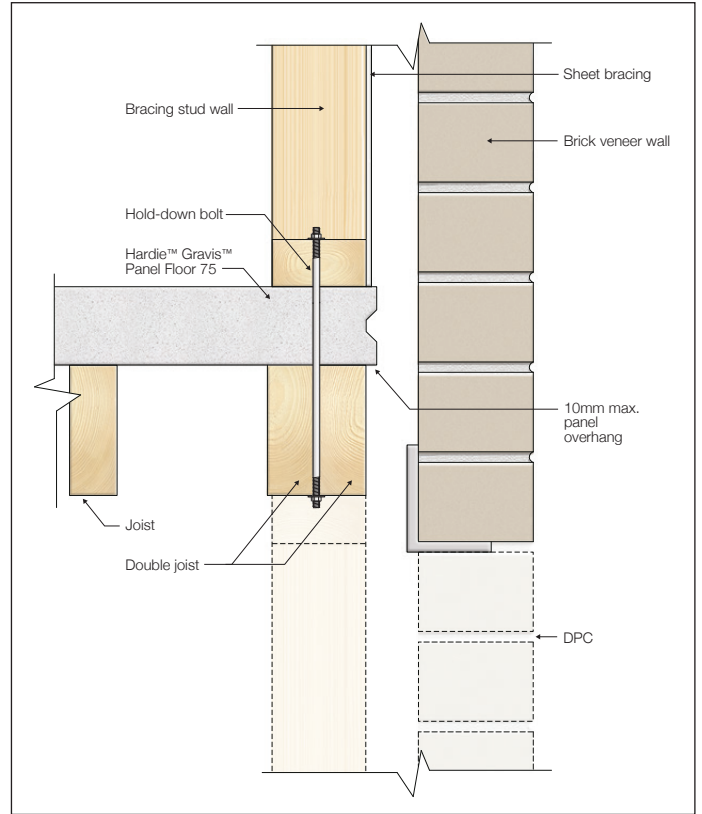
FLOOR WITH ANCHORAGE OF EXTERNAL BRACING WALL OVER SUPPORT WALL
